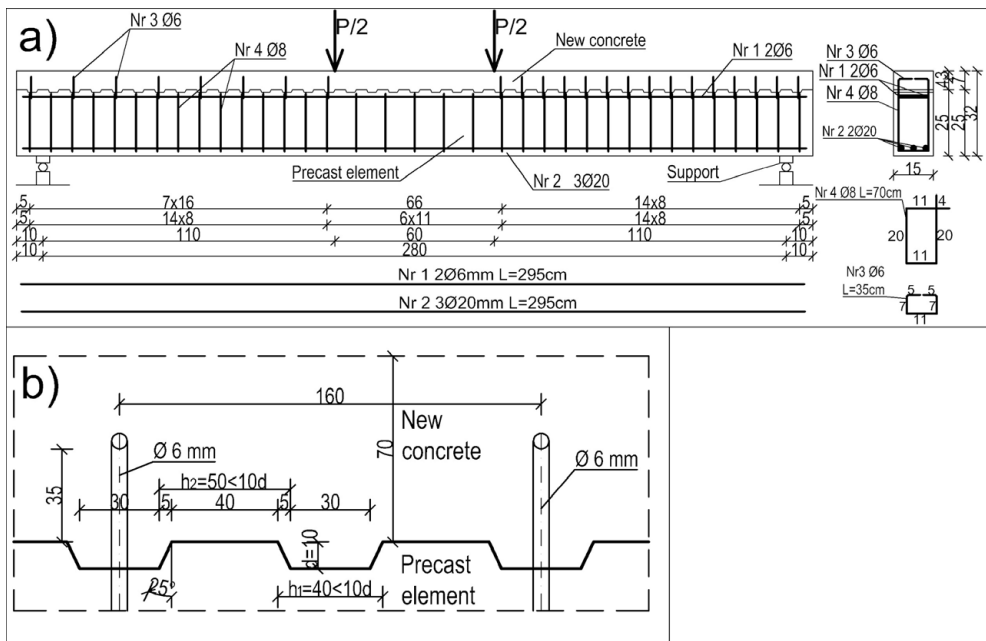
Beam element a) dimensions and reinforcement scheme, b) precast surface with notches. *Source: own study
